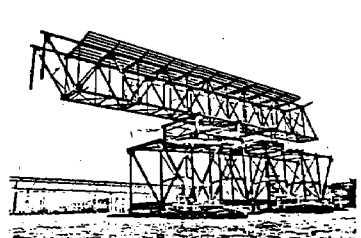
South bridge. Off-site truss erected on barges being moved upstream for final erection in structure
